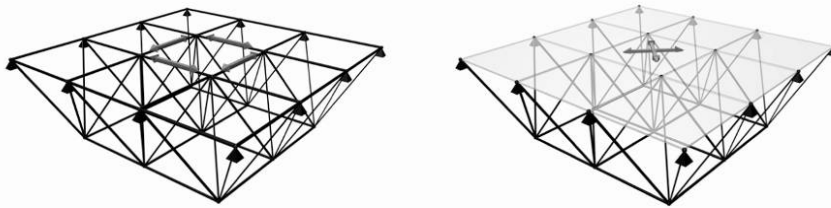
Compression elements in the upper layer in a traditional space grid structures and a space grid structure with glass panes as load bearing element
